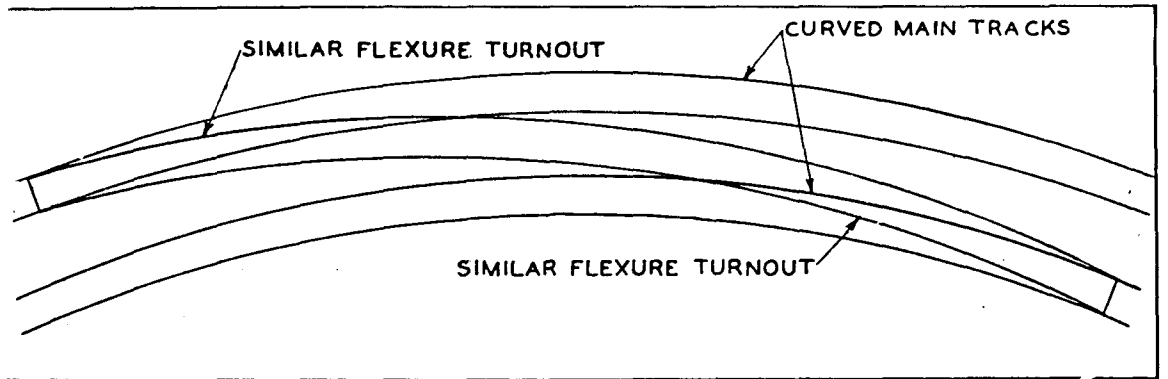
CROSSOVER USING SIMILAR FLEXURE TURNOUTS
